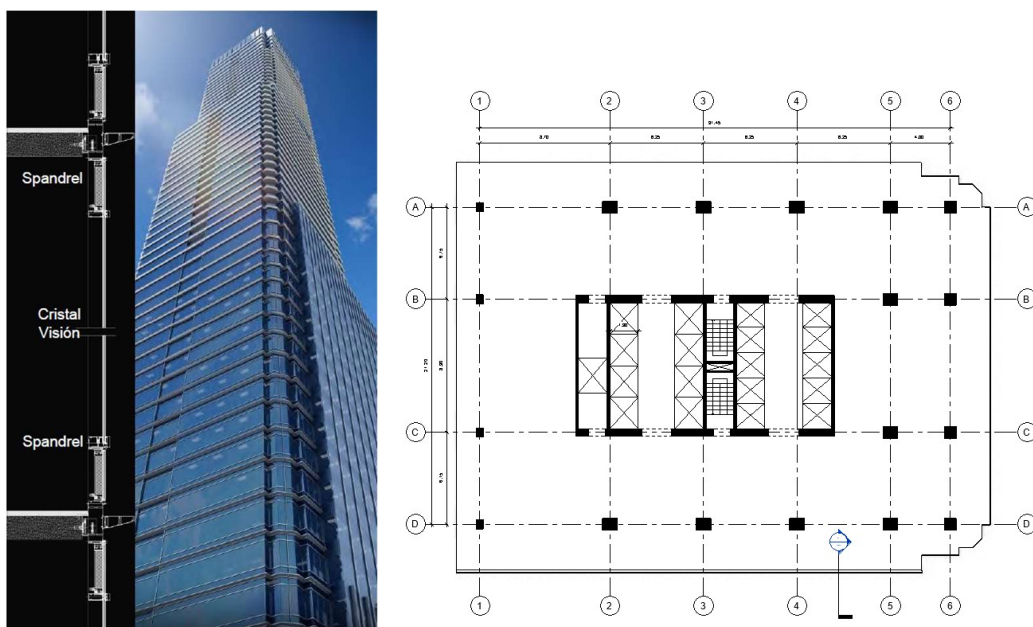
Façade section, mullion detail and main floor plan. Source: <https://v-fo.com/projects/koi-tower/>
